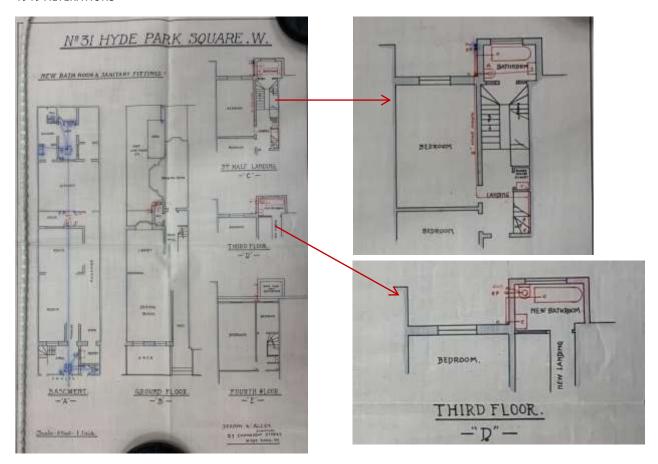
Alterations to Basement, Ground, 3^{rd} and 4^{th} Floors
